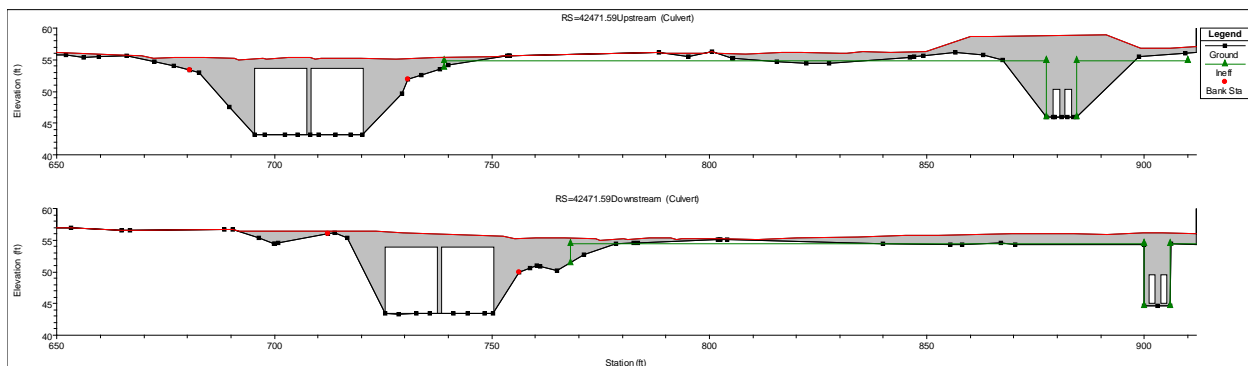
Cross Section of Wareham Street Culvert in Corrected Effective Model
